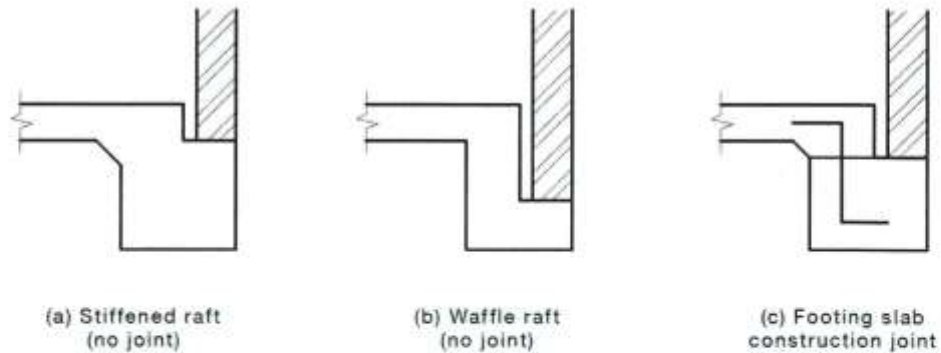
EXAMPLES OF FOOTING SYSTEMS REQUIRING NO JOINT TREATMENT
